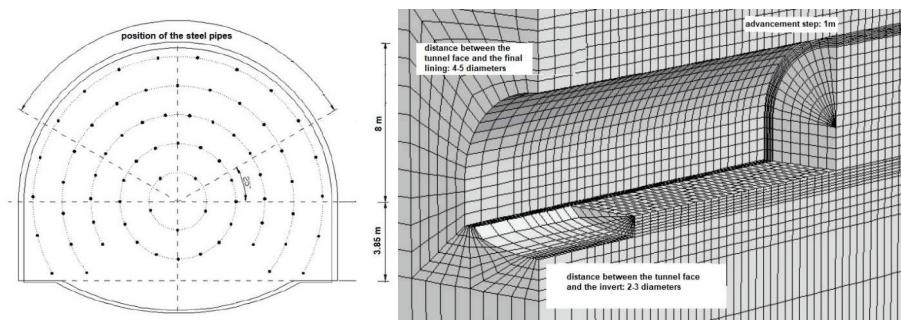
Geometry of the tunnel at the tunnel face, position of the modelled face reinforcement, and detail of the position of the final lining with reference to the tunnel face.
